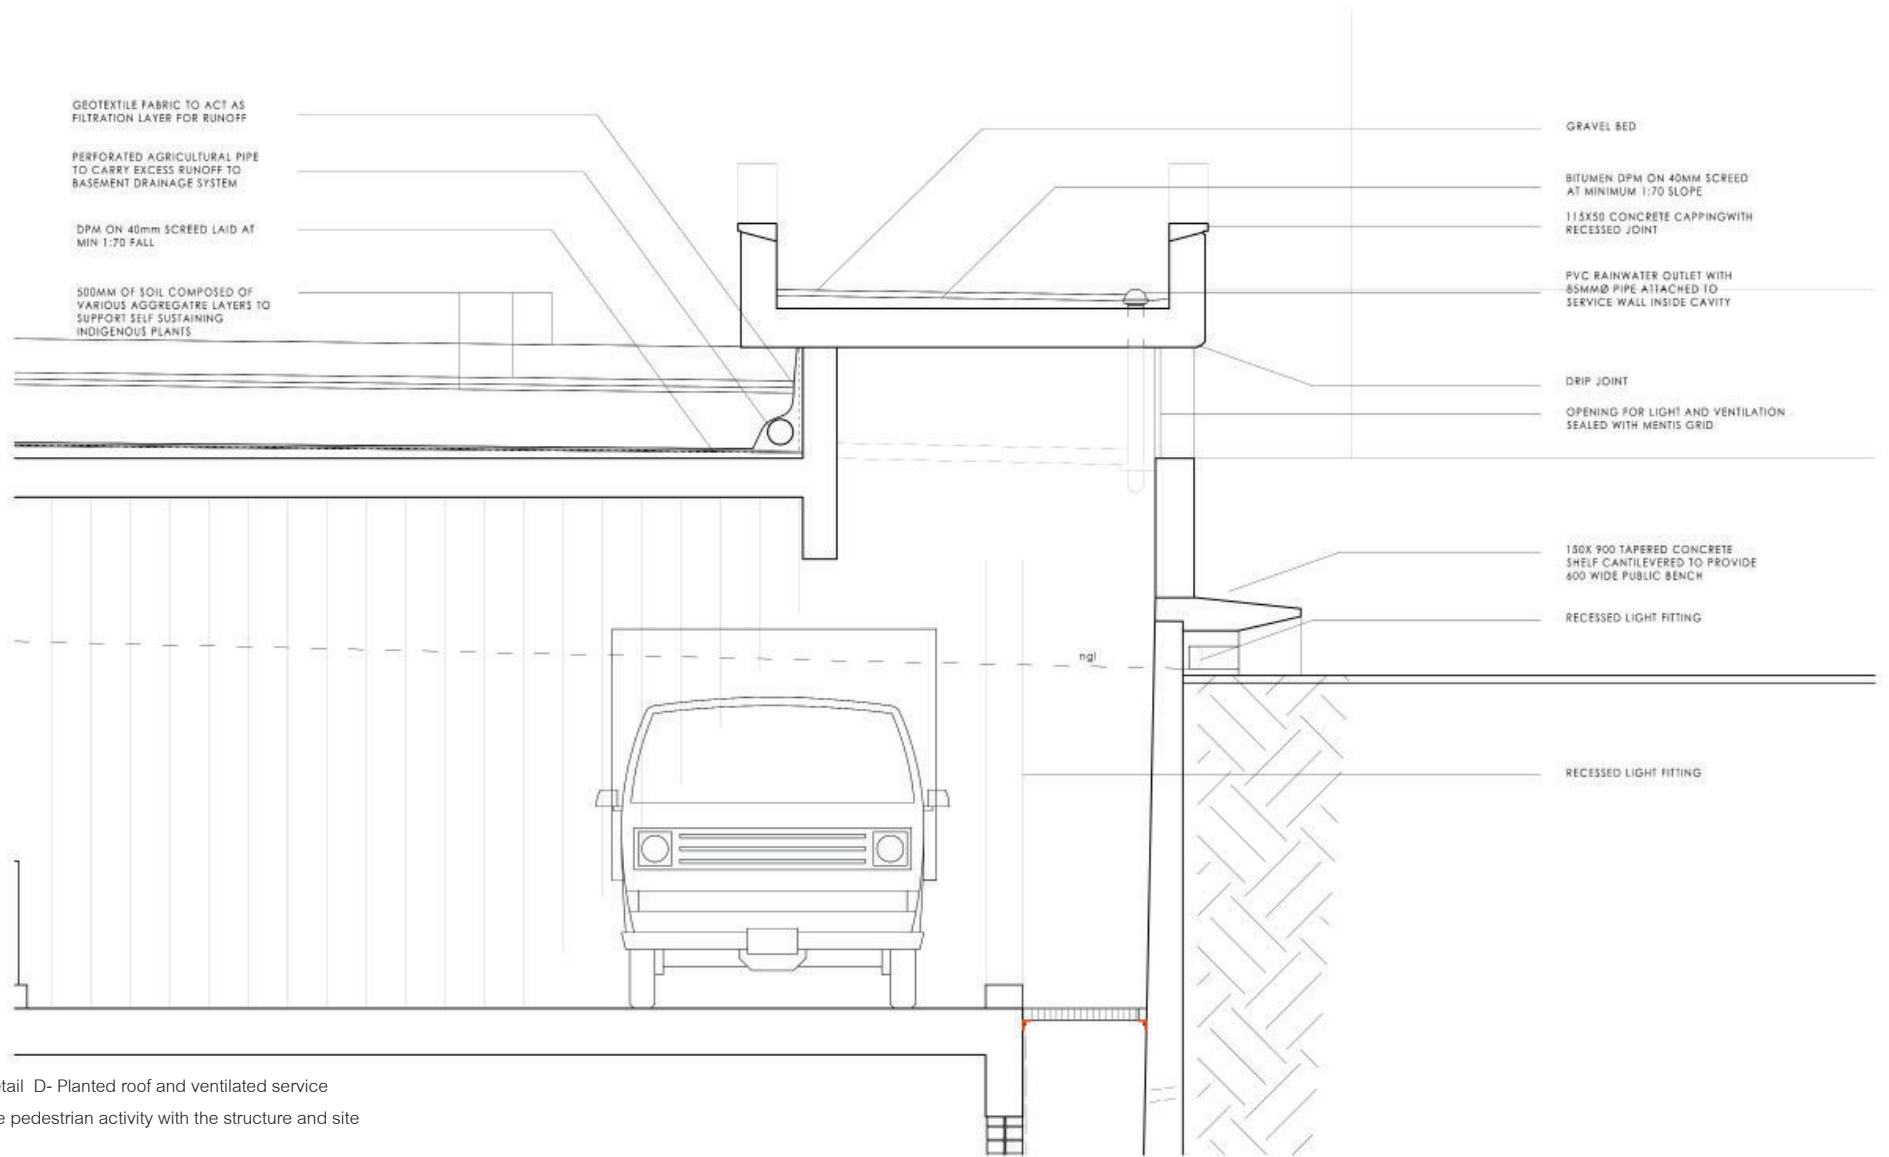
Detail D- Planted roof and ventilated service cavity introduce pedestrian activity with the structure and site
